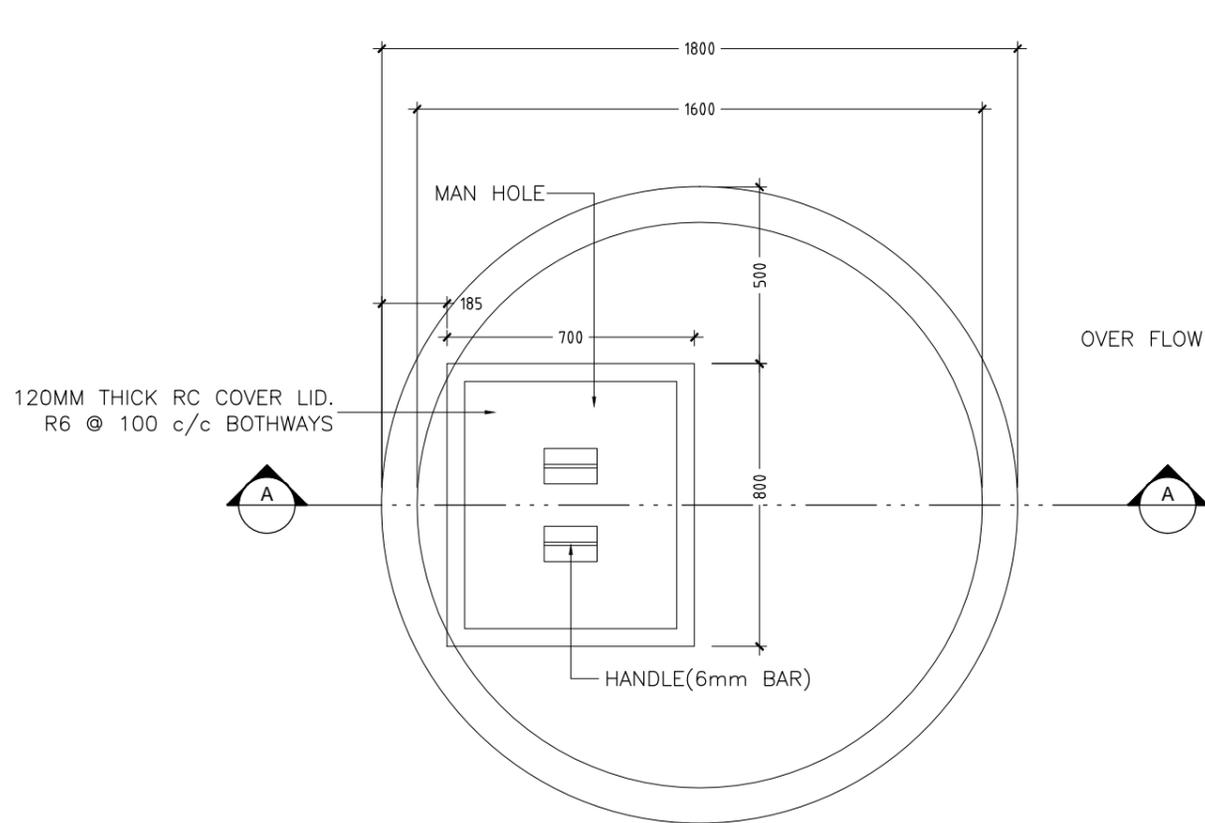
DETAIL A / PLAN VIEW OF INSPECTION POINT
